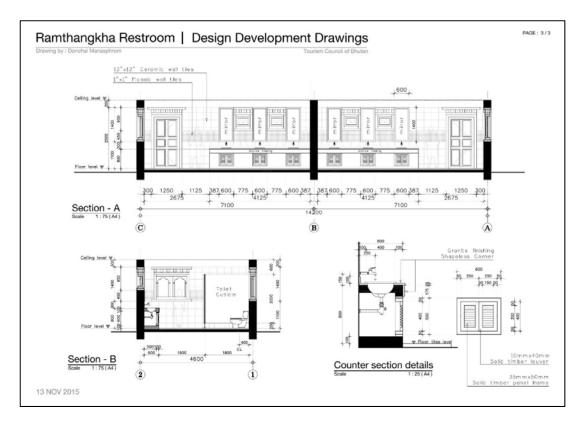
Renovation drawings of Ramthangkha (Taktsang base) restrooms
